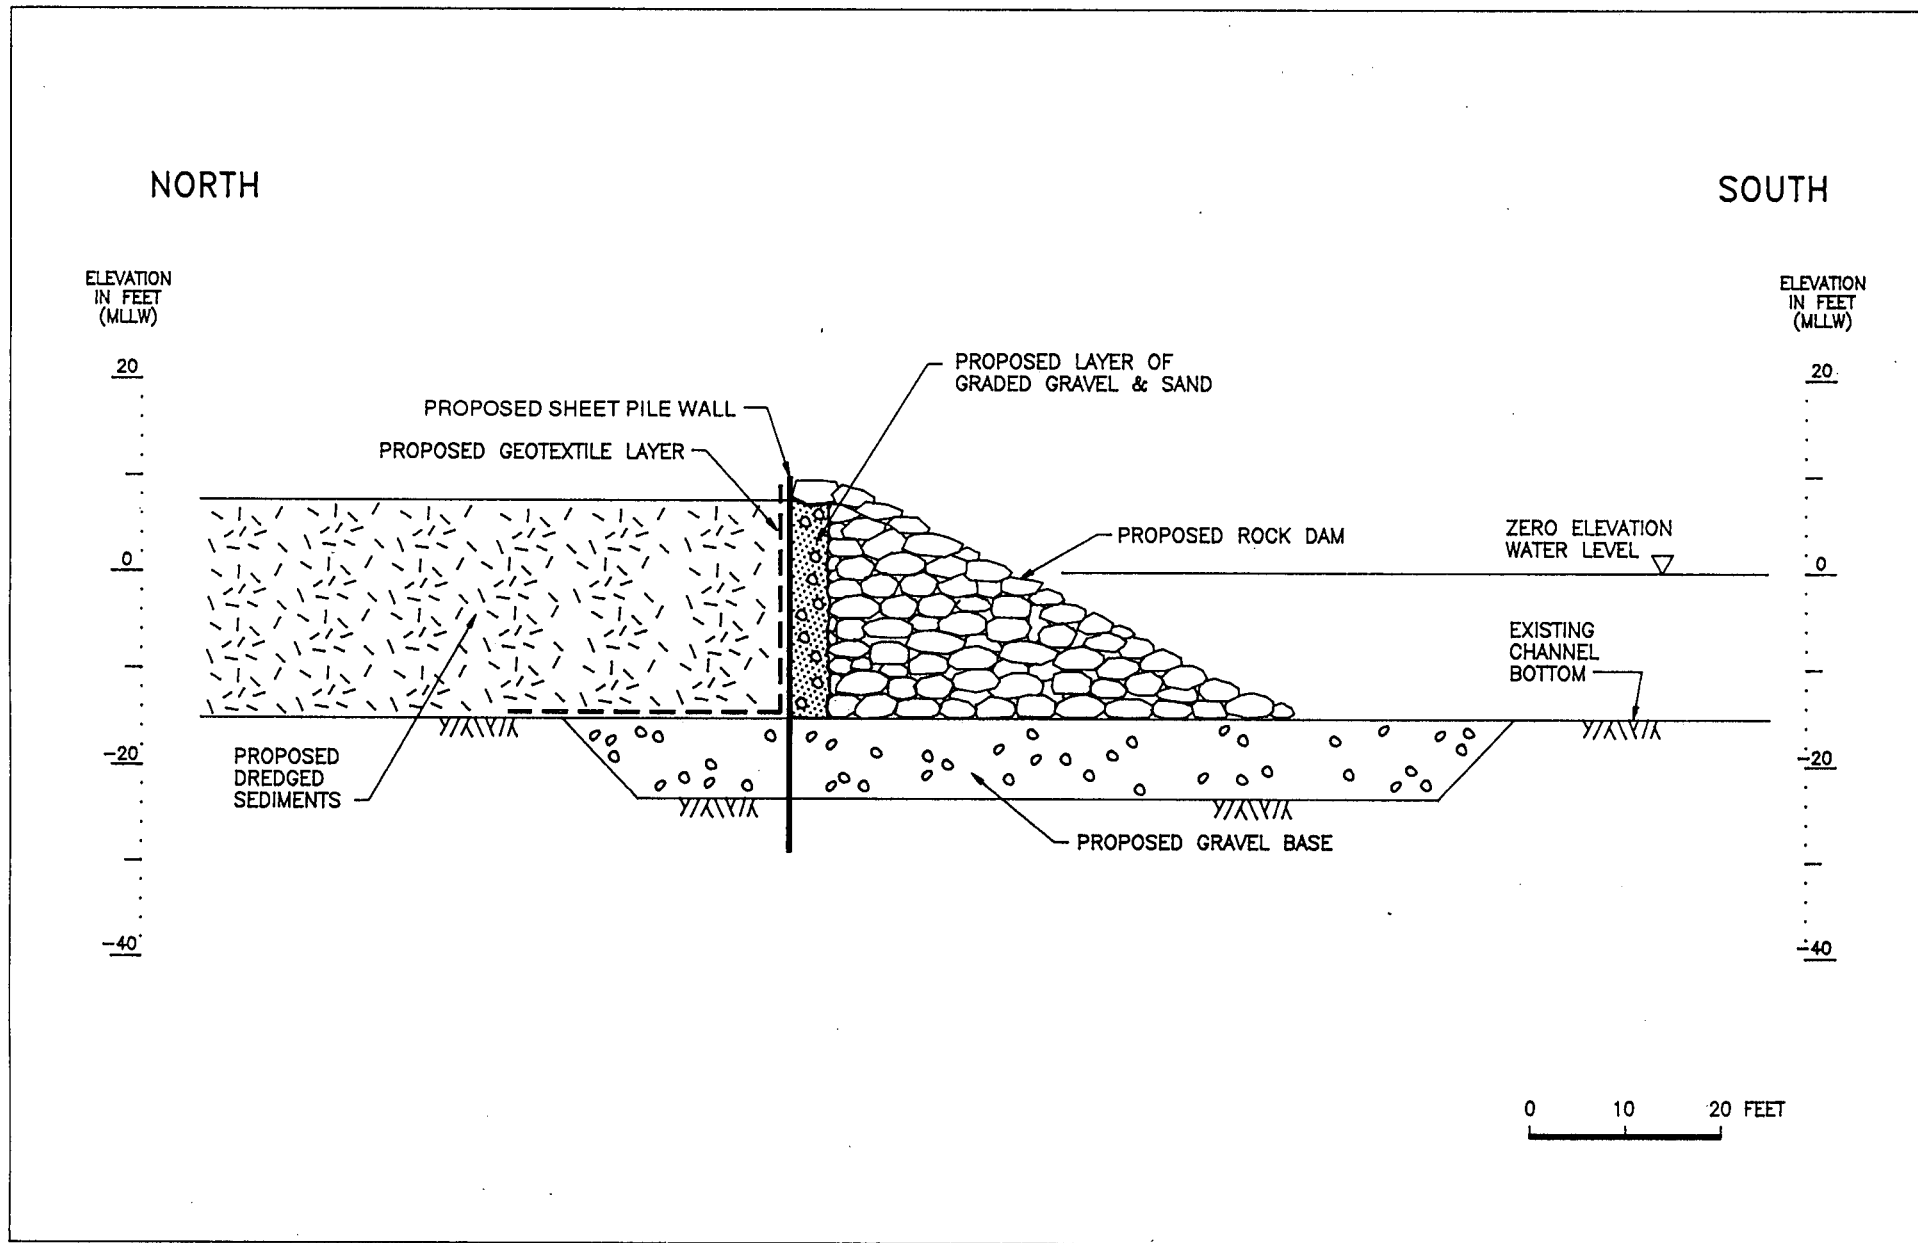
CROSS SECTION OF PROPOSED ROCK DAM - SHEET PILE WALL
